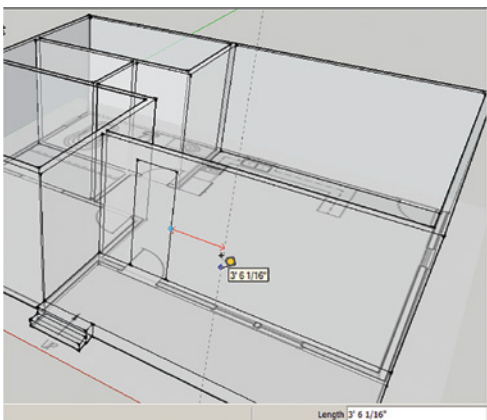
Guidelines drawn in plan can be used to place the window opening.
